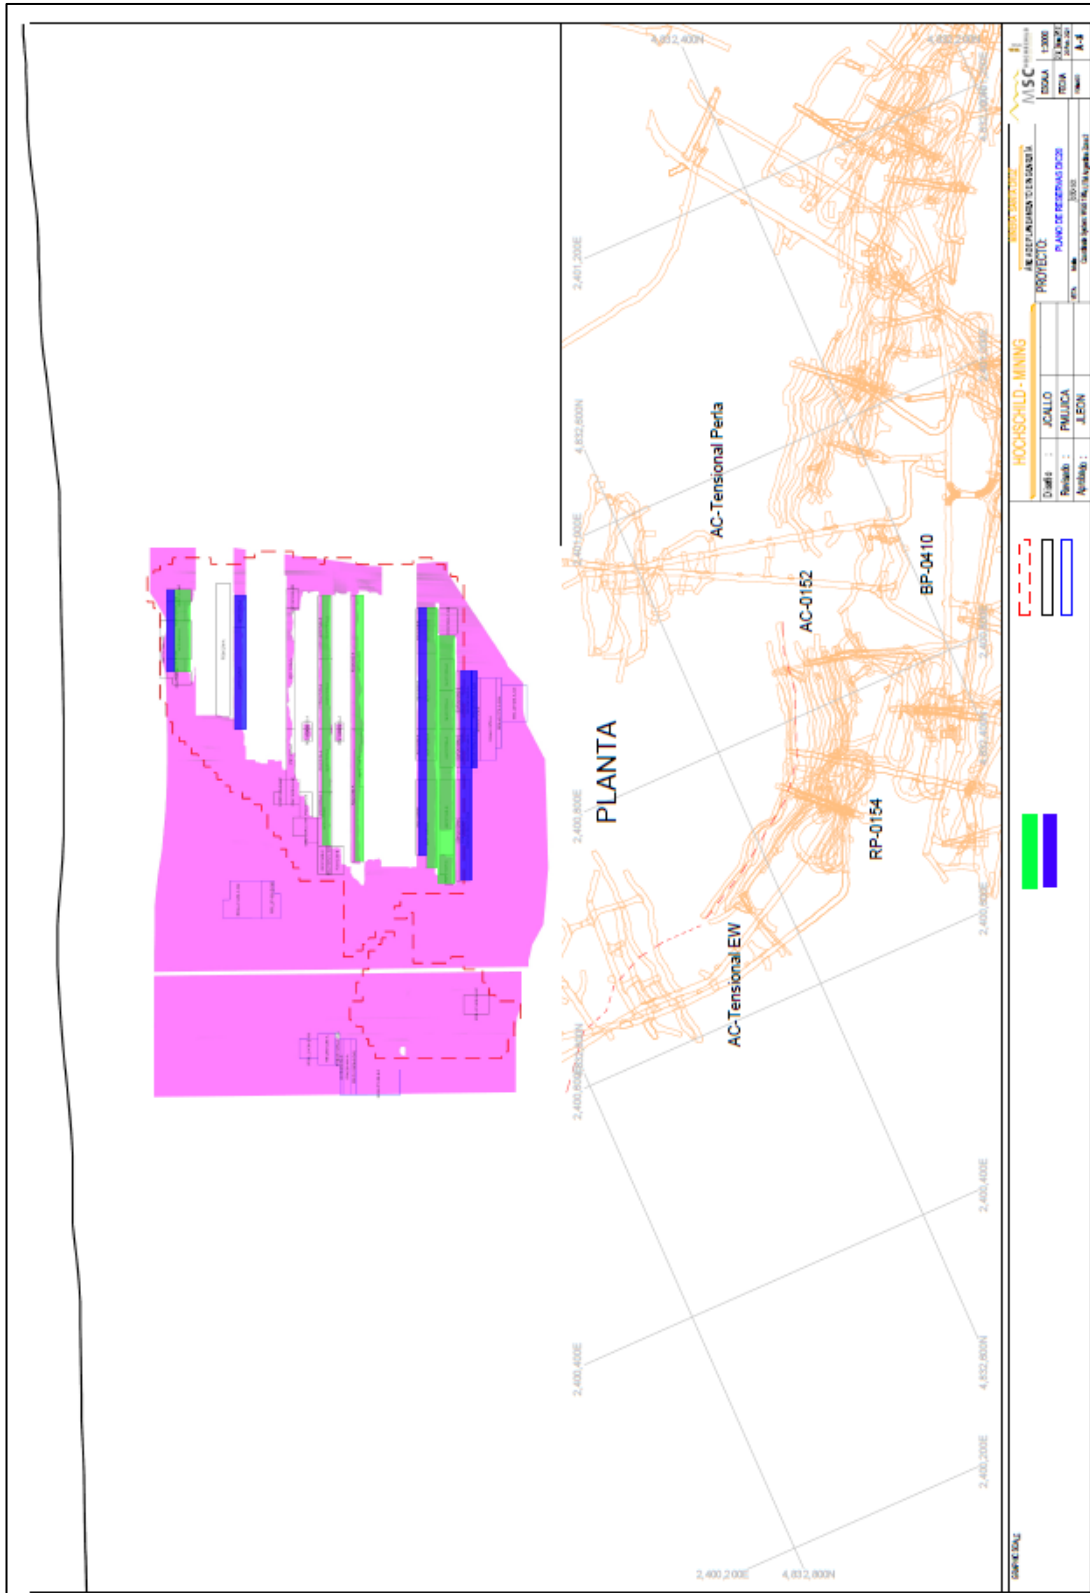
Longitudinal Projection and Plan View of Molle Vein – Source: Hochschild (2021)
